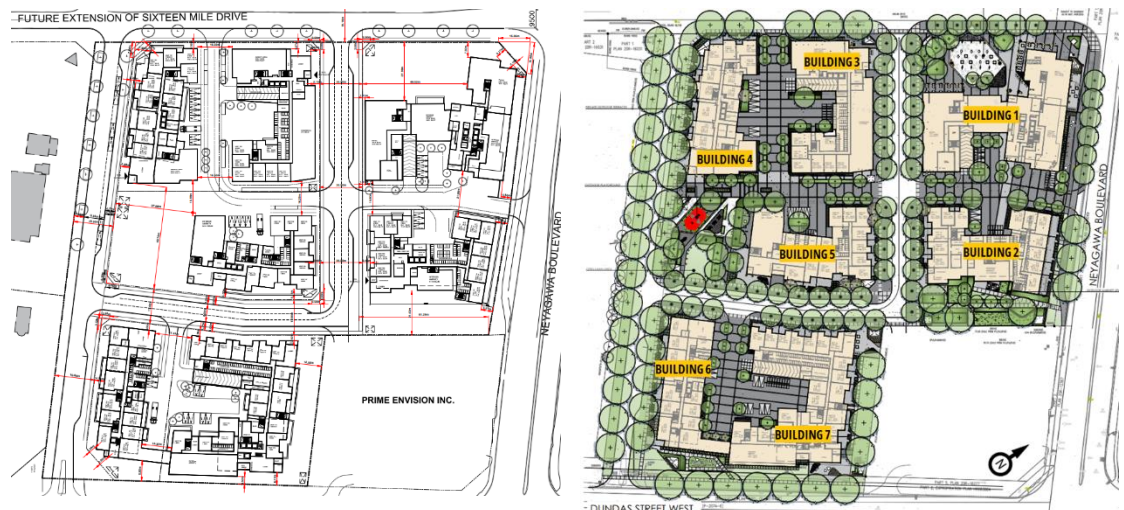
Architectural Plan (Left) and Landscape Plan (Right) in 2024
